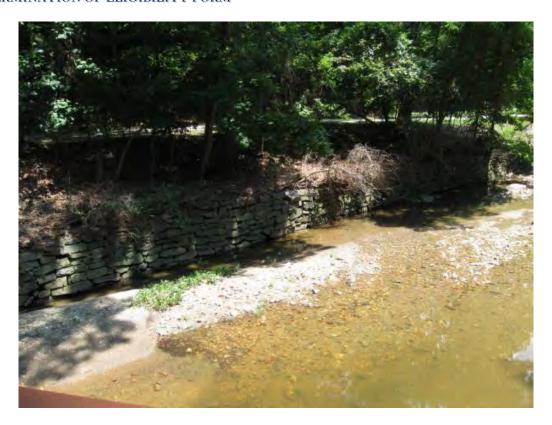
Dry laid tabular stone retaining wall (Segment 1) located on the east side of Broad Branch, between Broad Branch Road Bridge and Ridge Road Bridge.
